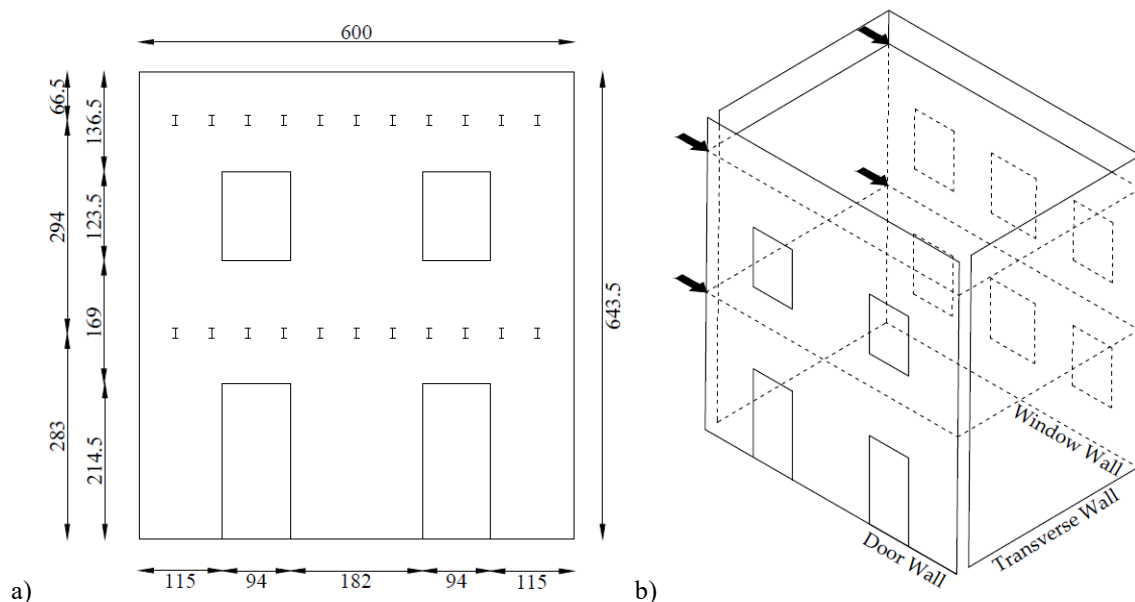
a) Front view of the Door Wall (measurements are in cm); (b) application of the horizontal forces
